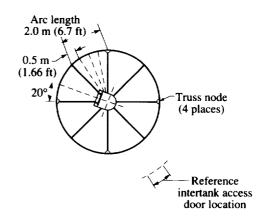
Fourth floor of lunar habitat. Floor outside diameter, 5.2 m (17 ft); Total floor area minus Area of access opening, 20 m<sup>2</sup> (217 ft<sup>2</sup>).
